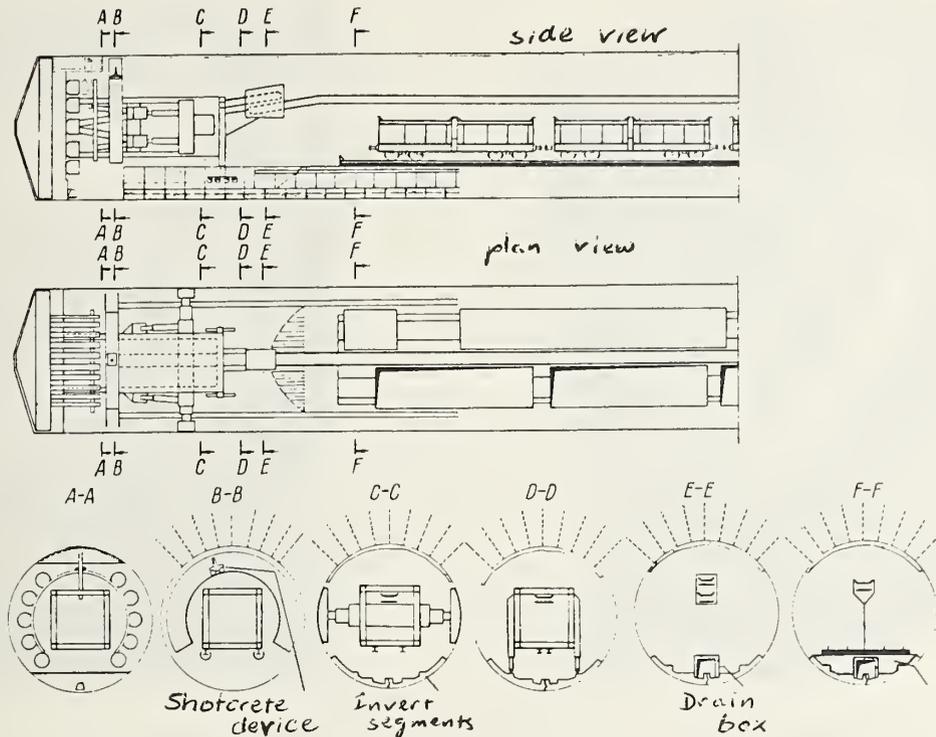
Tunneling Machine Equipped With Bolt Drilling and Shotcrete Equipment for Systematic Stabilizing of The Rock Mass and Extension of The Tunnel Invert During Tunneling Advance
